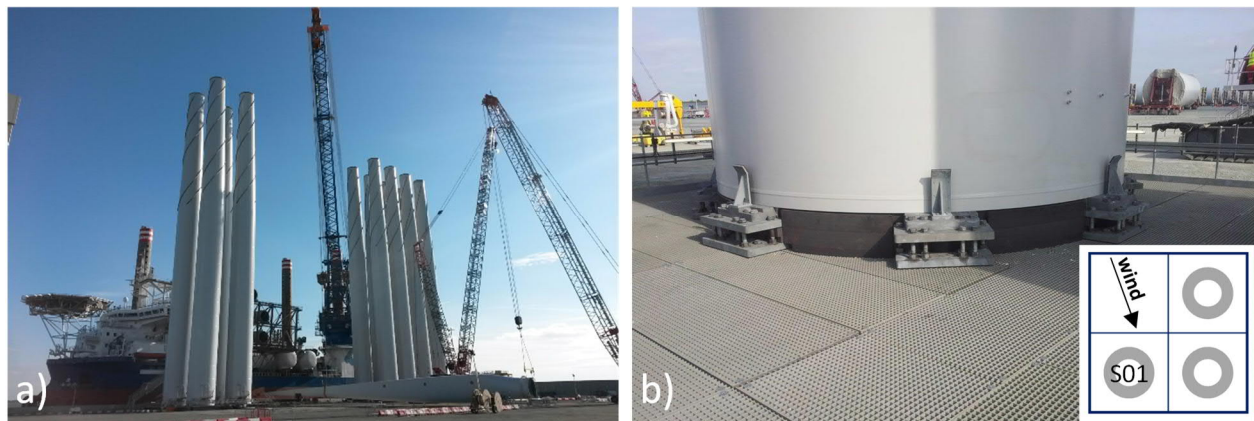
Temporary tower foundations at the port quayside a); tower supported by LEBs b).
